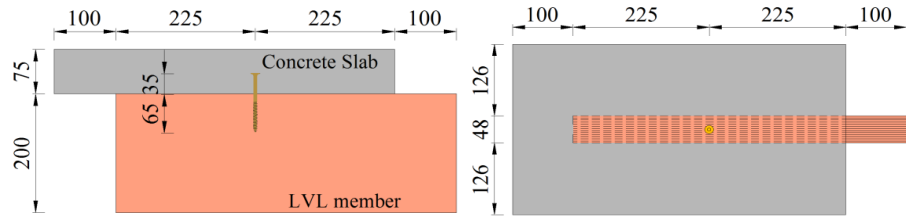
Single WS specimen: (a) cross-section, (b) plan view (in mm)
